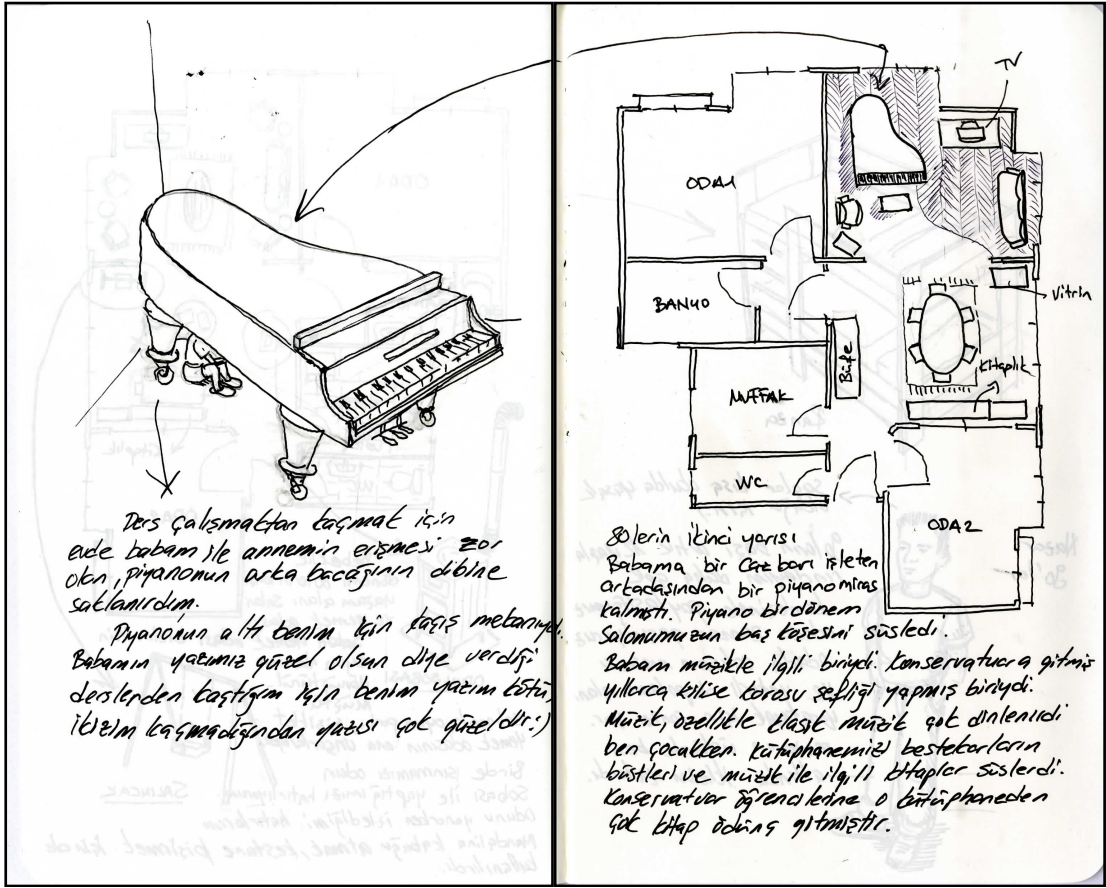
(left): Şigaher's sketch of himself hiding under the piano, a hide away place
